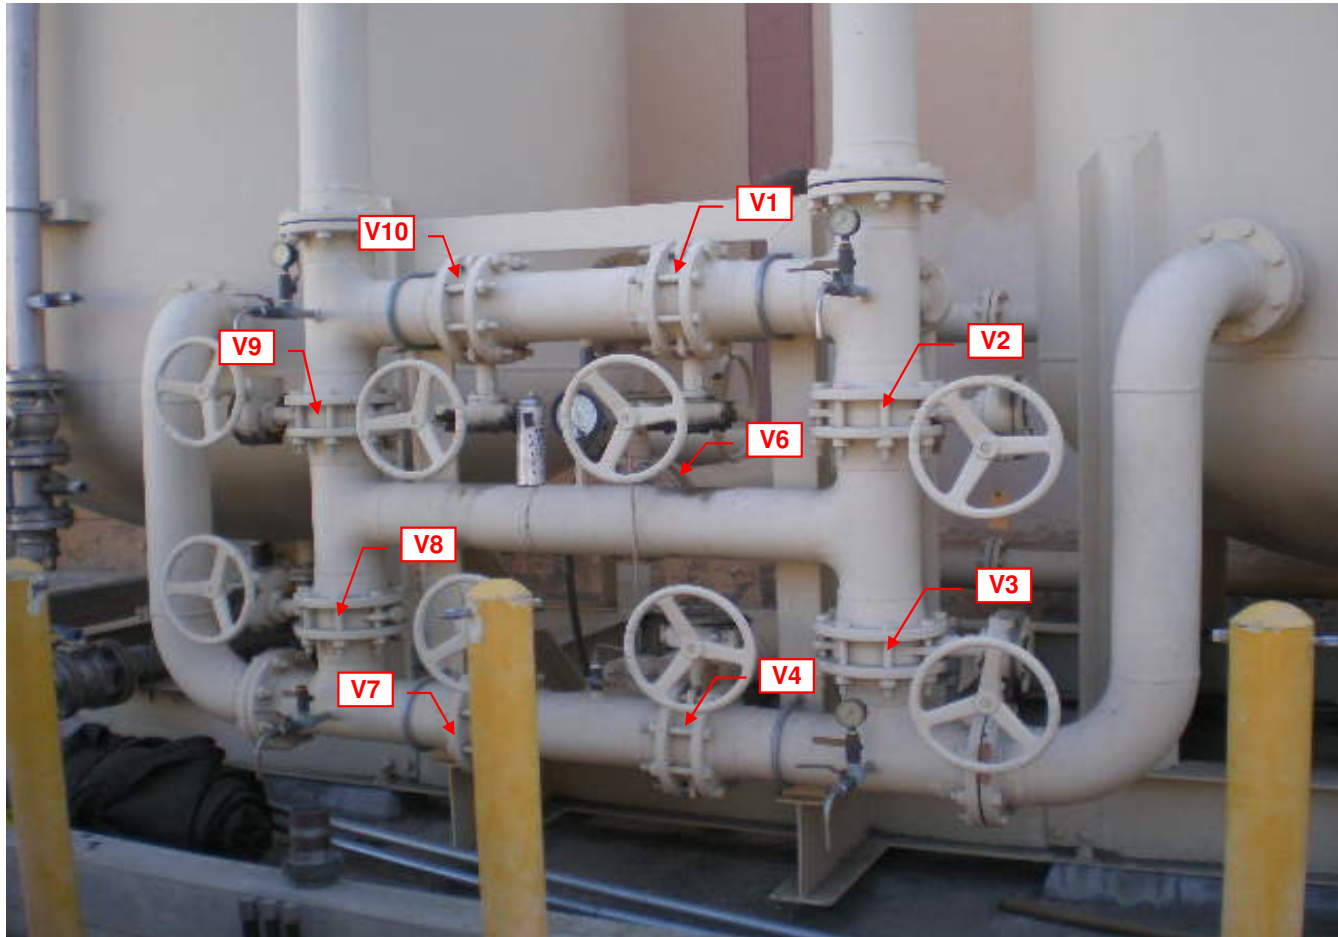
Photograph of WBA Vessel Valve Tree with Valve Identification Tags
